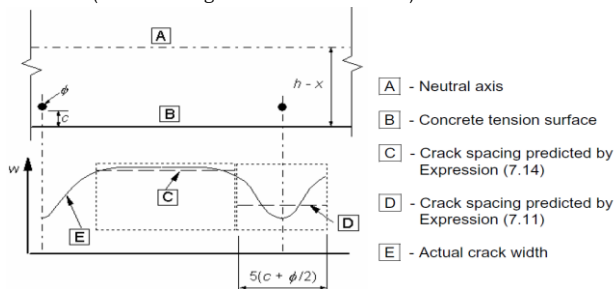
Crack width, w, at concrete surface relative to distance from bar [21]
